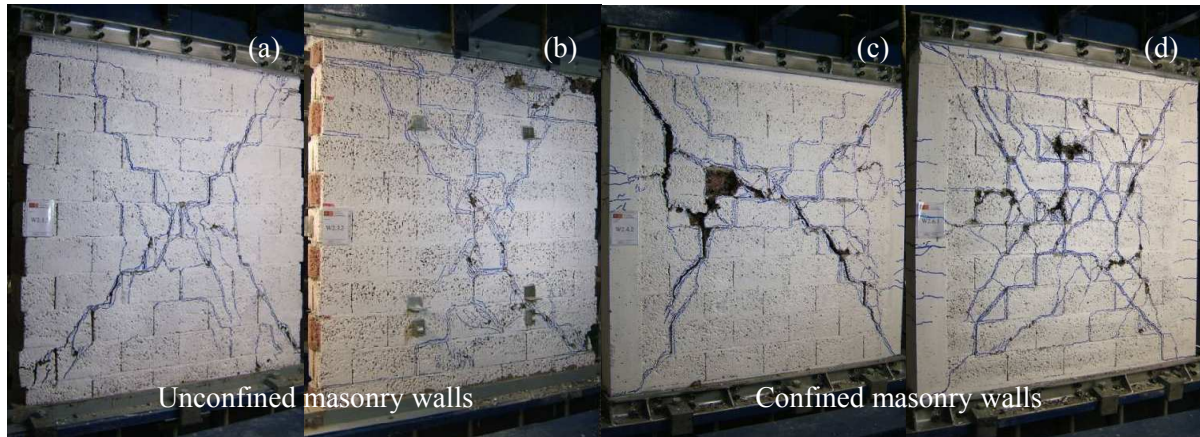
Failure modes: (a) unreinforced wall W2.1; (b) light horizontally reinforced wall W2.3; (c) confined unreinforced wall W2.4; (d) confined and horizontally reinforced W2.6
